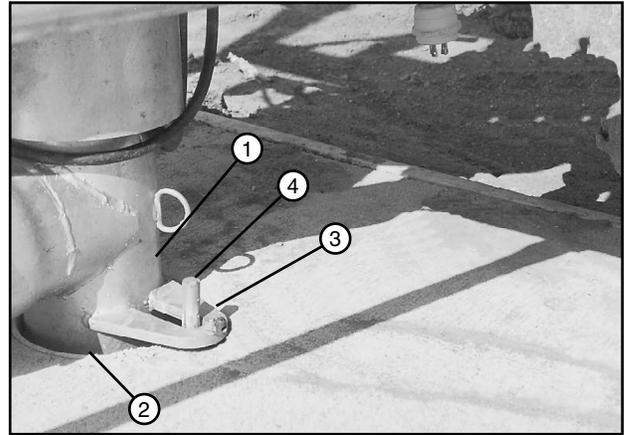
1. Riser Pipe 2. Anchor Pipe 3. Slotted Ear 4. Stud
